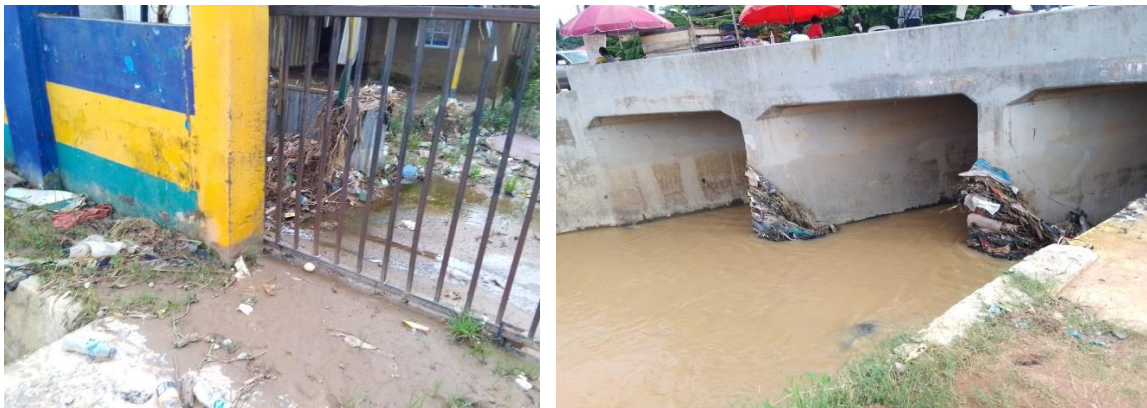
Showing the damage and the inadequacy of the Triple Box culvert.
